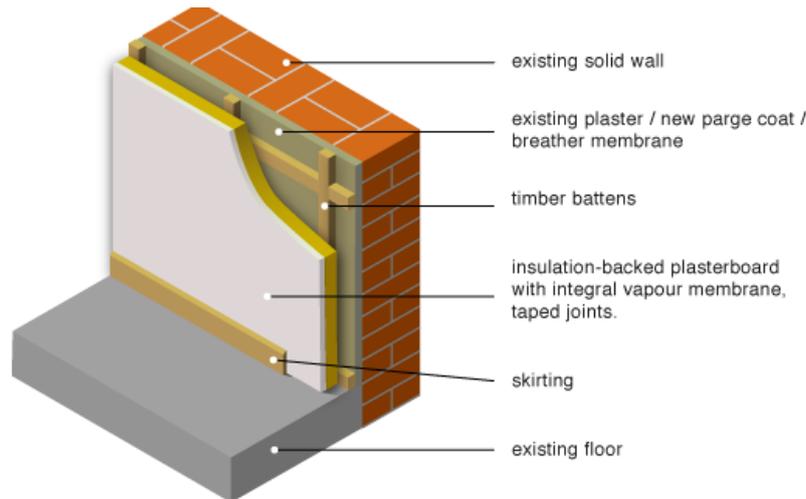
Insulation boards fixed to the wall timber battens and covered with plasterboard <sup>[13]</sup>
